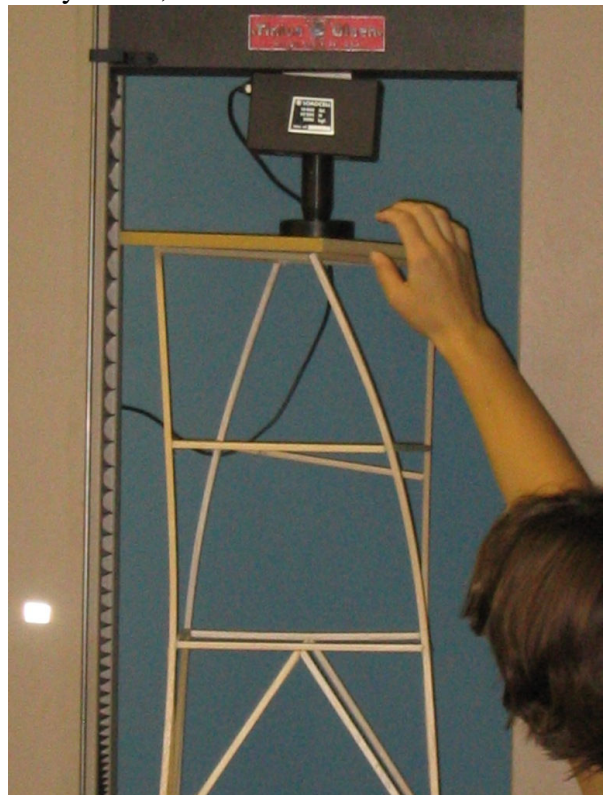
A sample tower is tested in a compression machine to demonstrate the importance of diagonal bracing.
